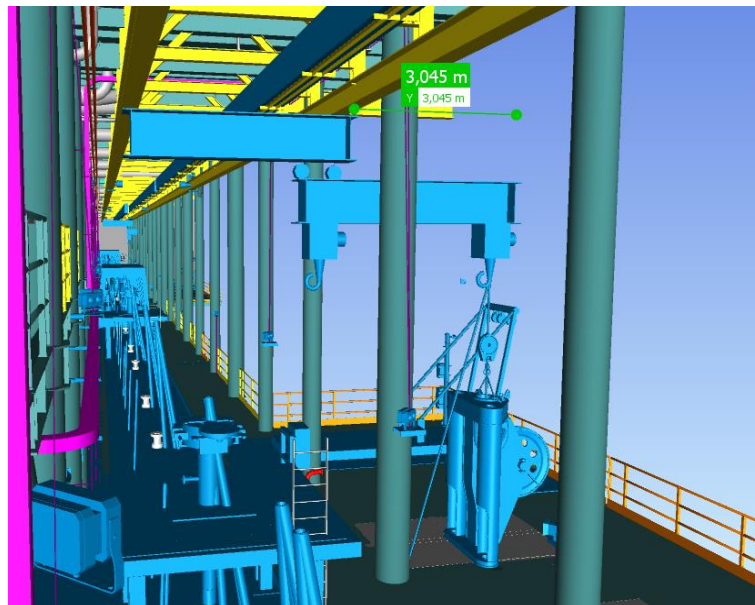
Overhead Crane sketch and opening on the diving station floor.
